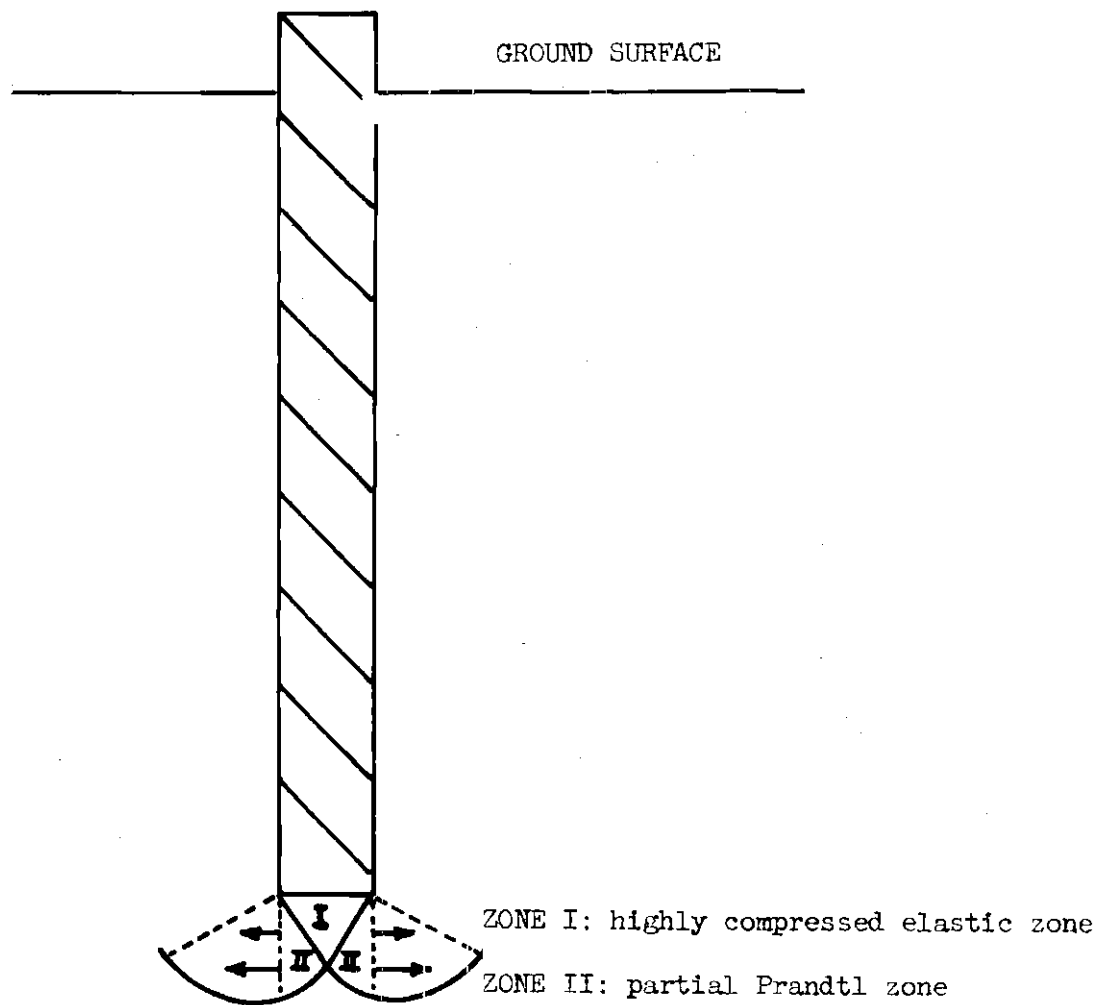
Assumed Bearing Capacity Failure Planes
